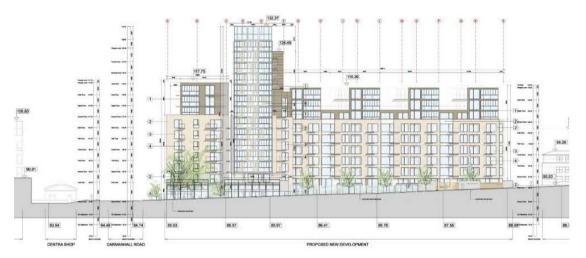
Elevation to Ravens Rock Road of development permitted under PA Reg Ref. D05A/0566
